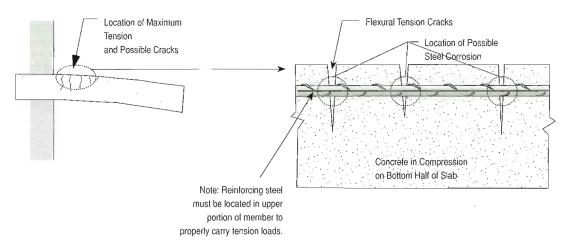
Illustration of Cracks in Cantilevered Slab (Emmons, 1993)
